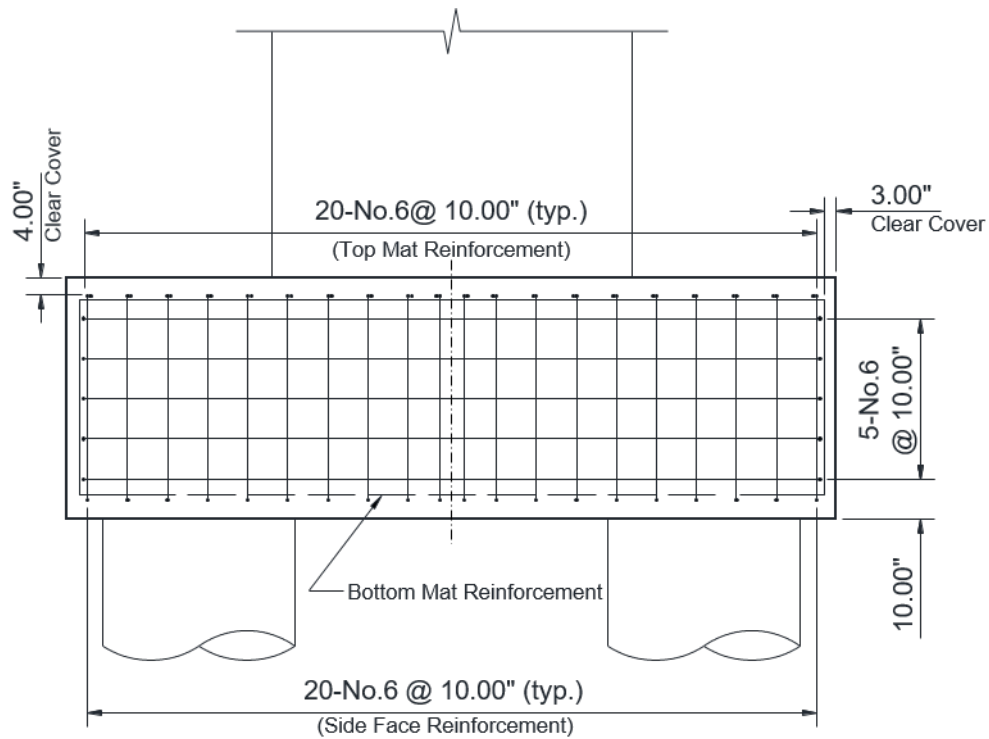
Details for shrinkage and temperature reinforcement: elevation view
